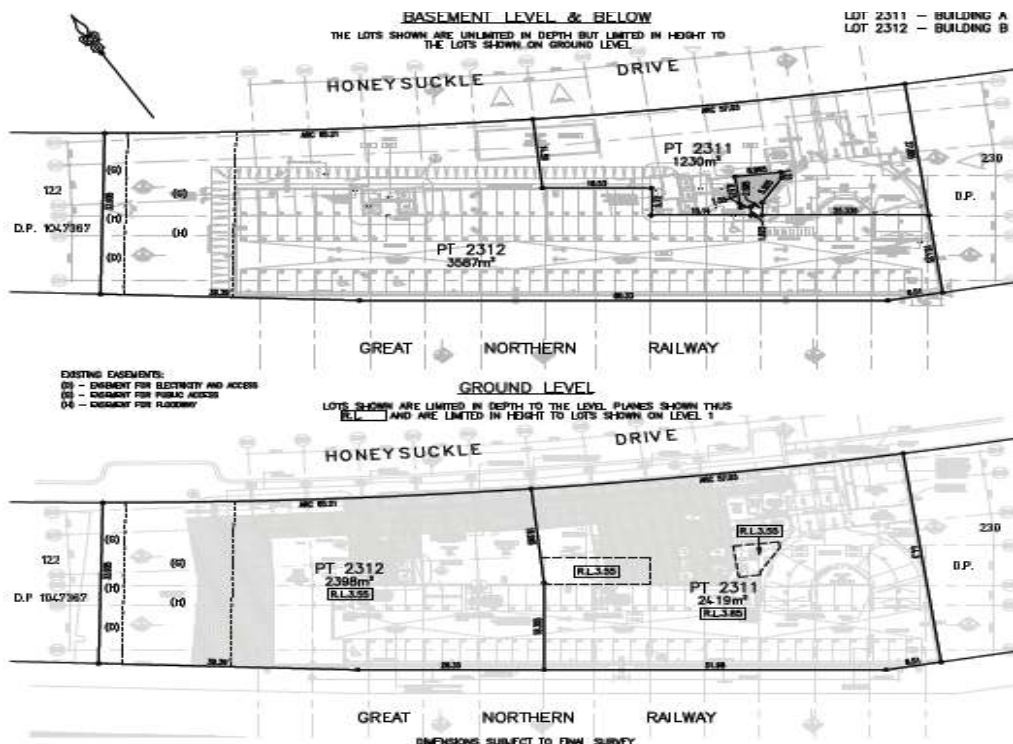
Subdivision proposal into 2 lots – Basement and Ground Floor Plan.
